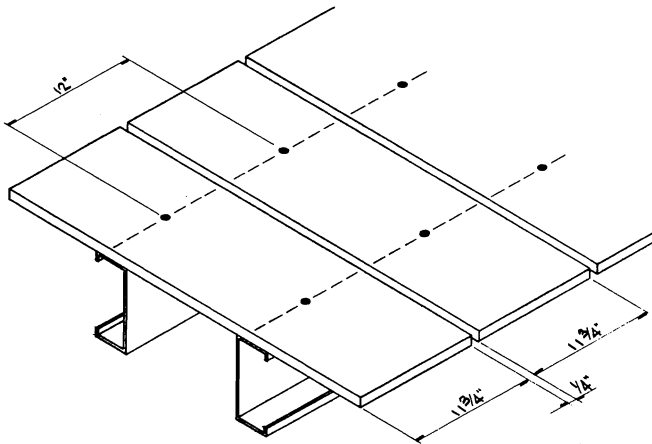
Third Full-Scale Test Specimen's Discontinuous Plywood Deck
